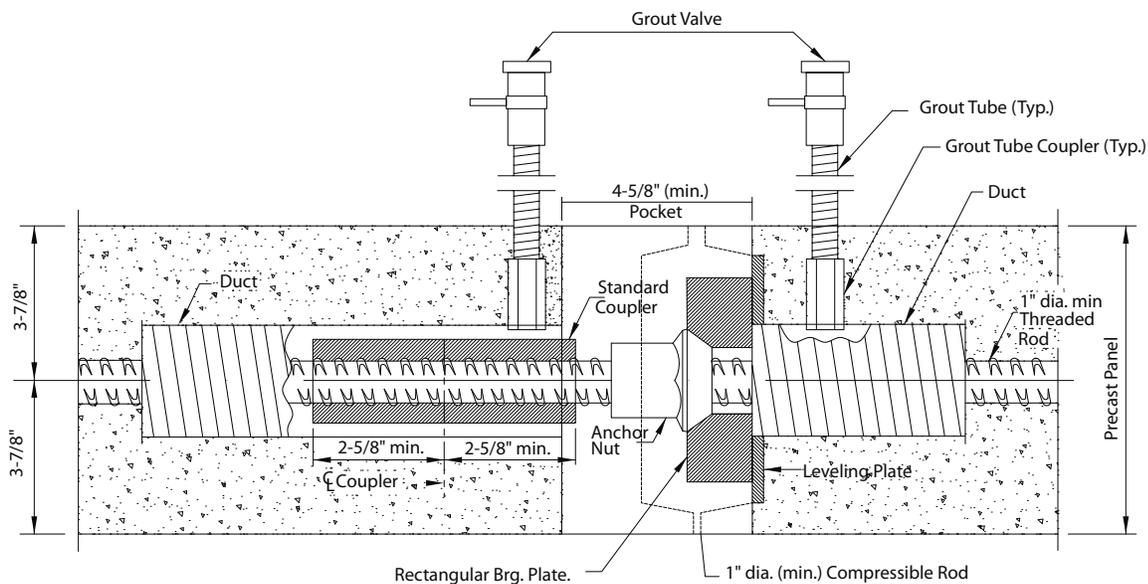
Post-tensioning detail used on Bridge-4 constructed on Route 75, Sangamon County, Ill.
